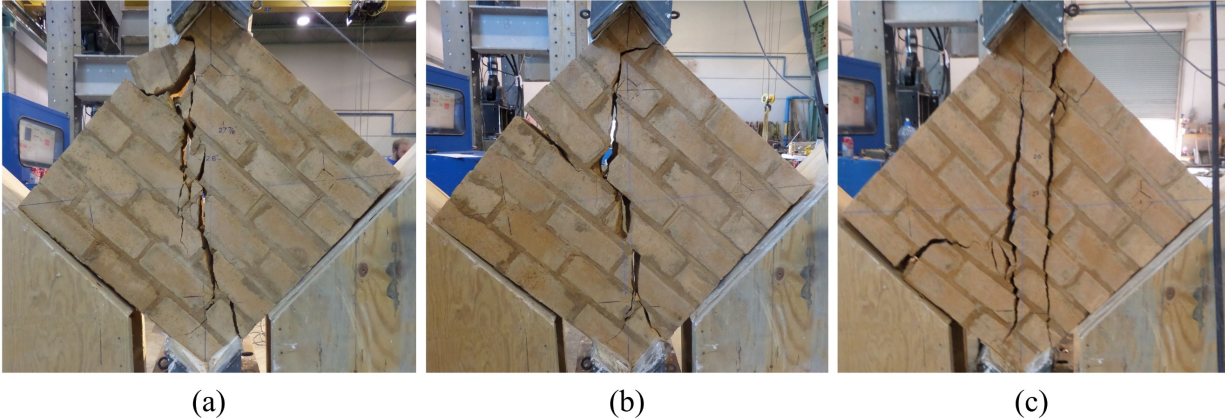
Experimental crack patterns of the CSEB masonry wallettes: (a) Wall-1, (b) Wall-2, and (c) Wall-3.
